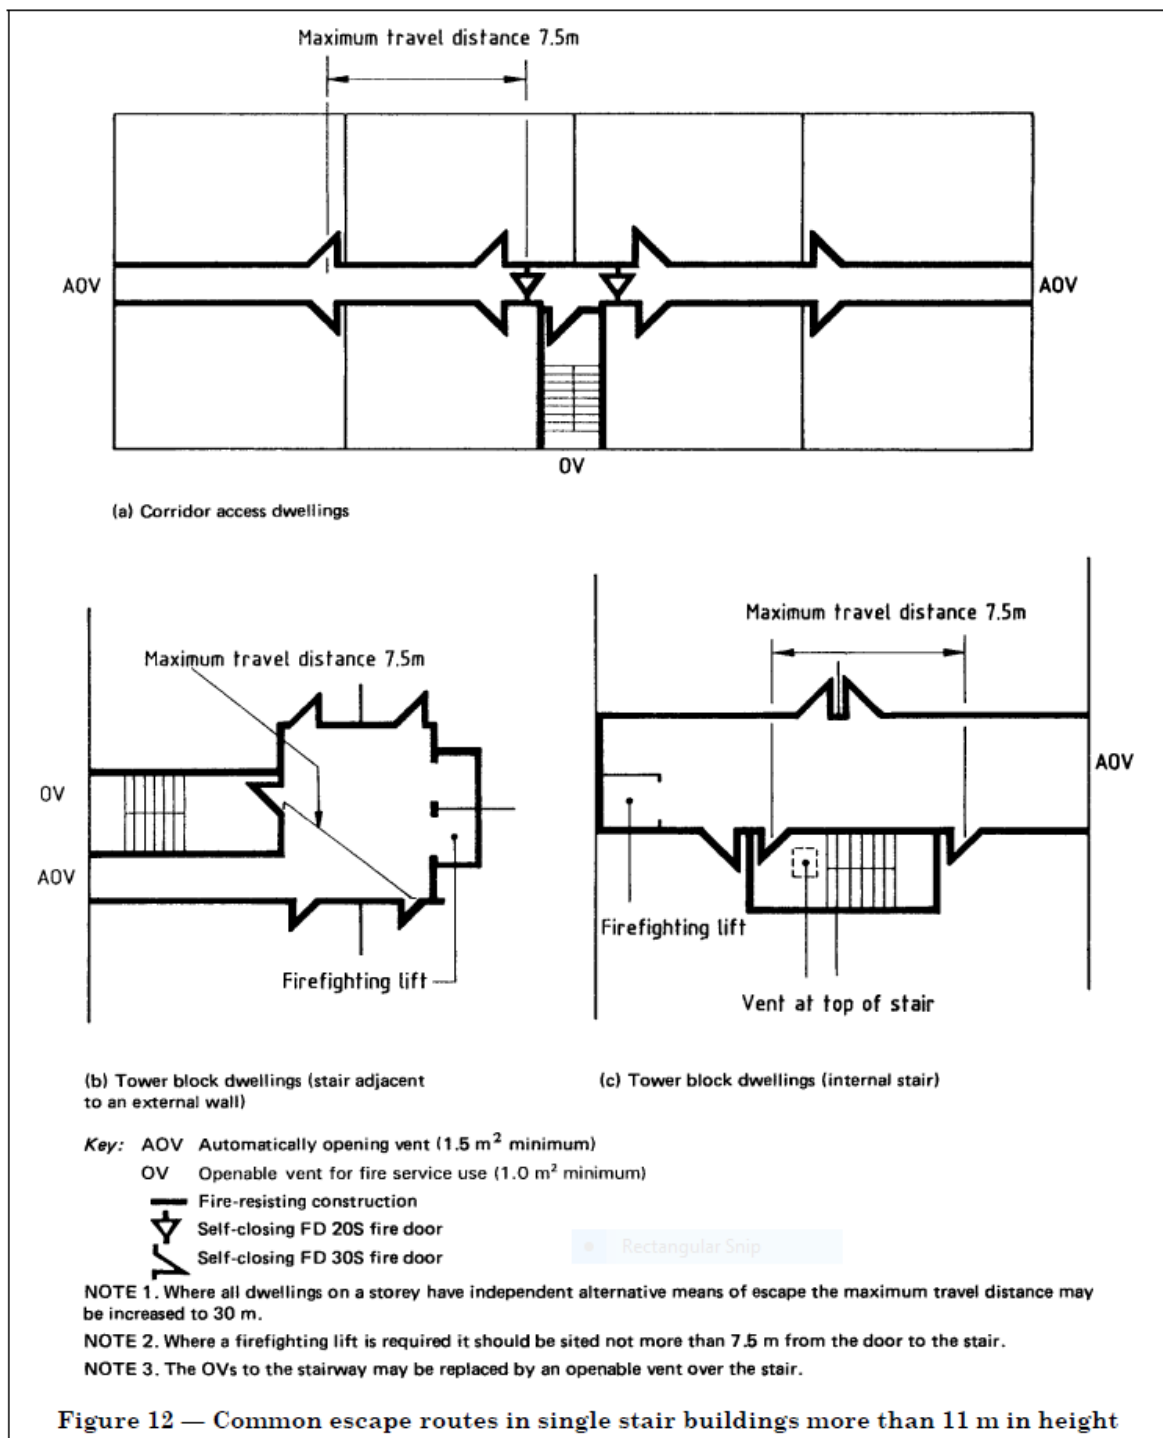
Common escape routes in single stair buildings more than 11 m in height
